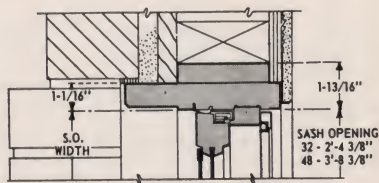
B JAMB SECTION. Frame wall construction showing 1/2" sheathing and lath and plaster on interior.
